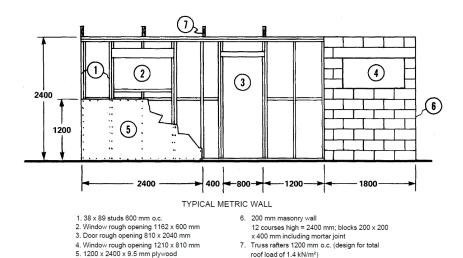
Construction drawing in metric with all dimensions in millimeters.
